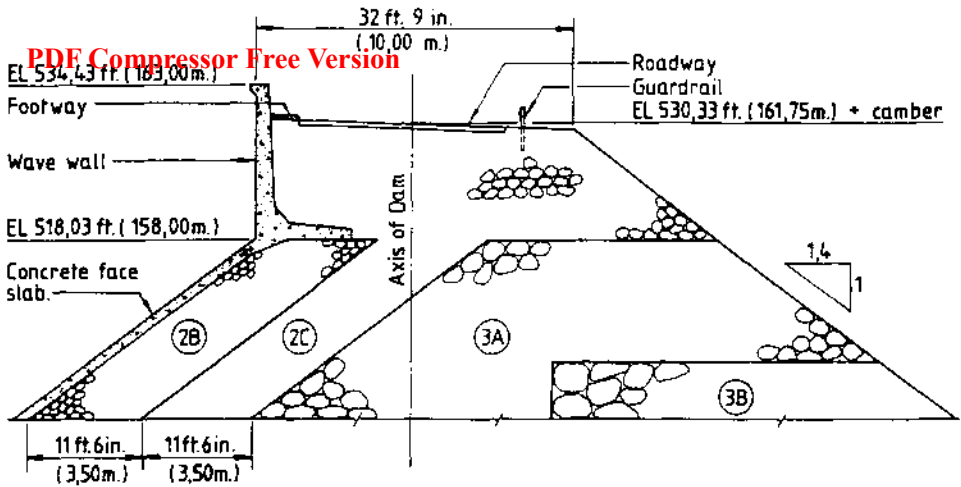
Crest detail, Khao Laem Dam (Watakeekul et al. 1985).
